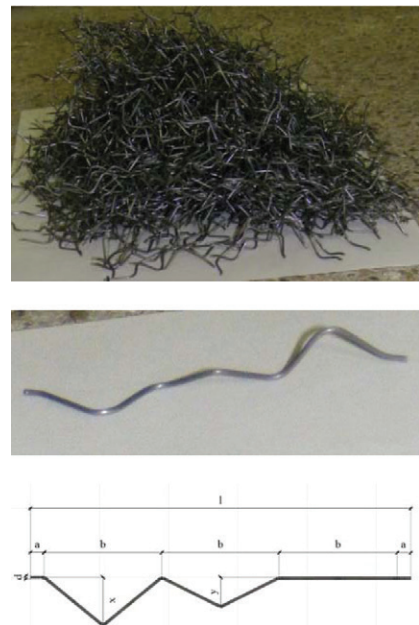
3D deformed, twisted steel fibre, PetiX S45
